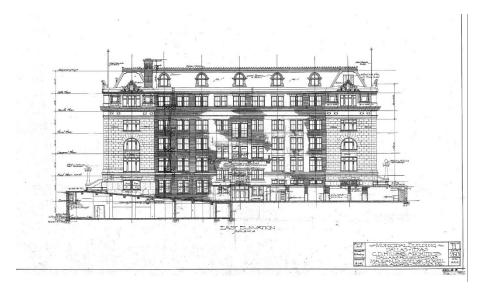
Front Elevation of Old City Hall (Dallas City Halls 1856-Present)
